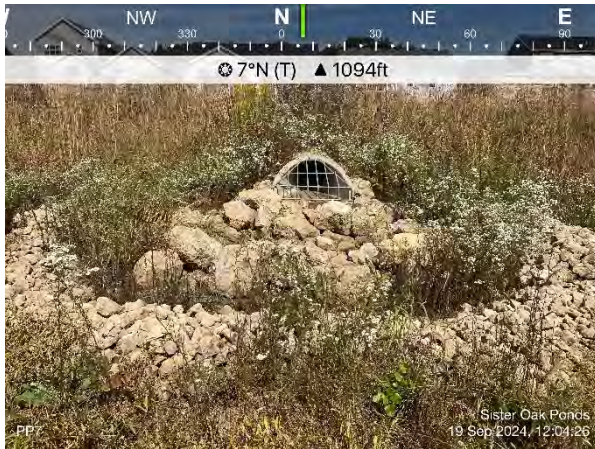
Photo point 7, view north facing the culvert outfall in the infiltration basin
